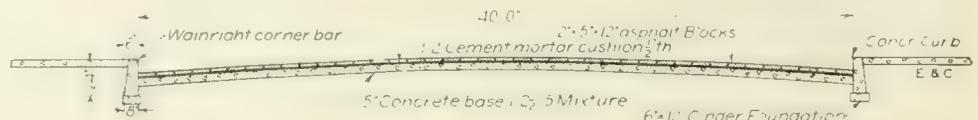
Cross Section of Street Paved with Asphalt Blocks, Newburgh, N. Y.
